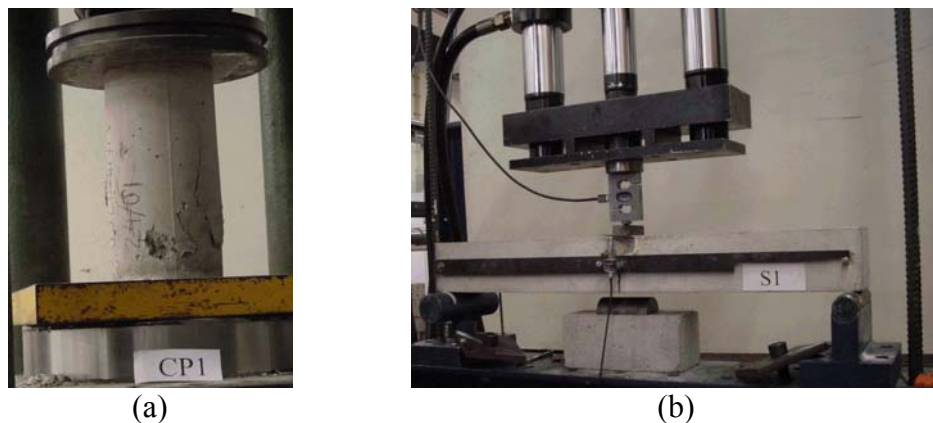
Tests carried out to characterize the adopted concrete mix: (a) uniaxial compression test on cylindrical specimens of concrete and (b) three-point bending tests on prismatic beams.
